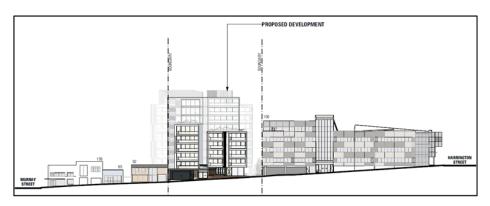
Melville Street elevation (source: JAWS ARCHITECTS, Site Plan, Dwg 19066_DA19, REV02 Mar 2020)
